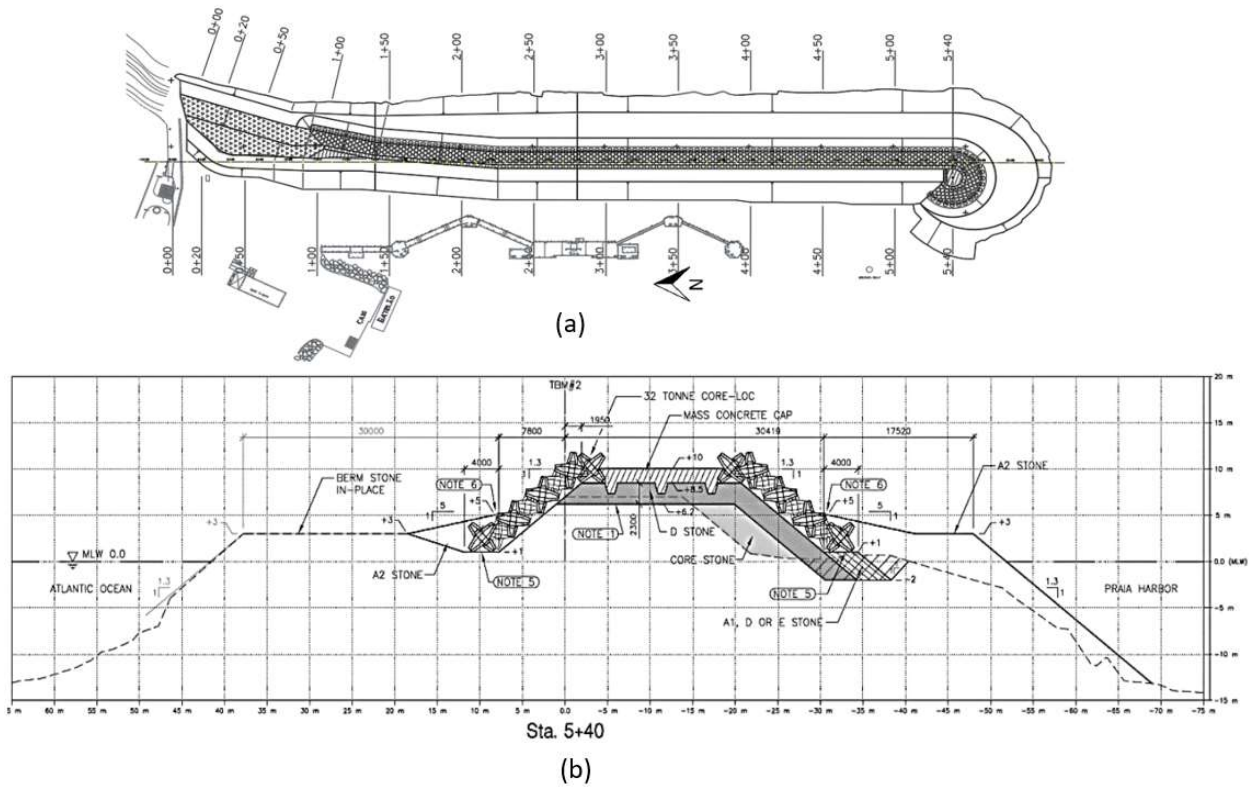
(a) Layout of the north breakwater with chainage, (b) details of cross section at chainage 5+40 (*Source: Poseiro (2019)*)
